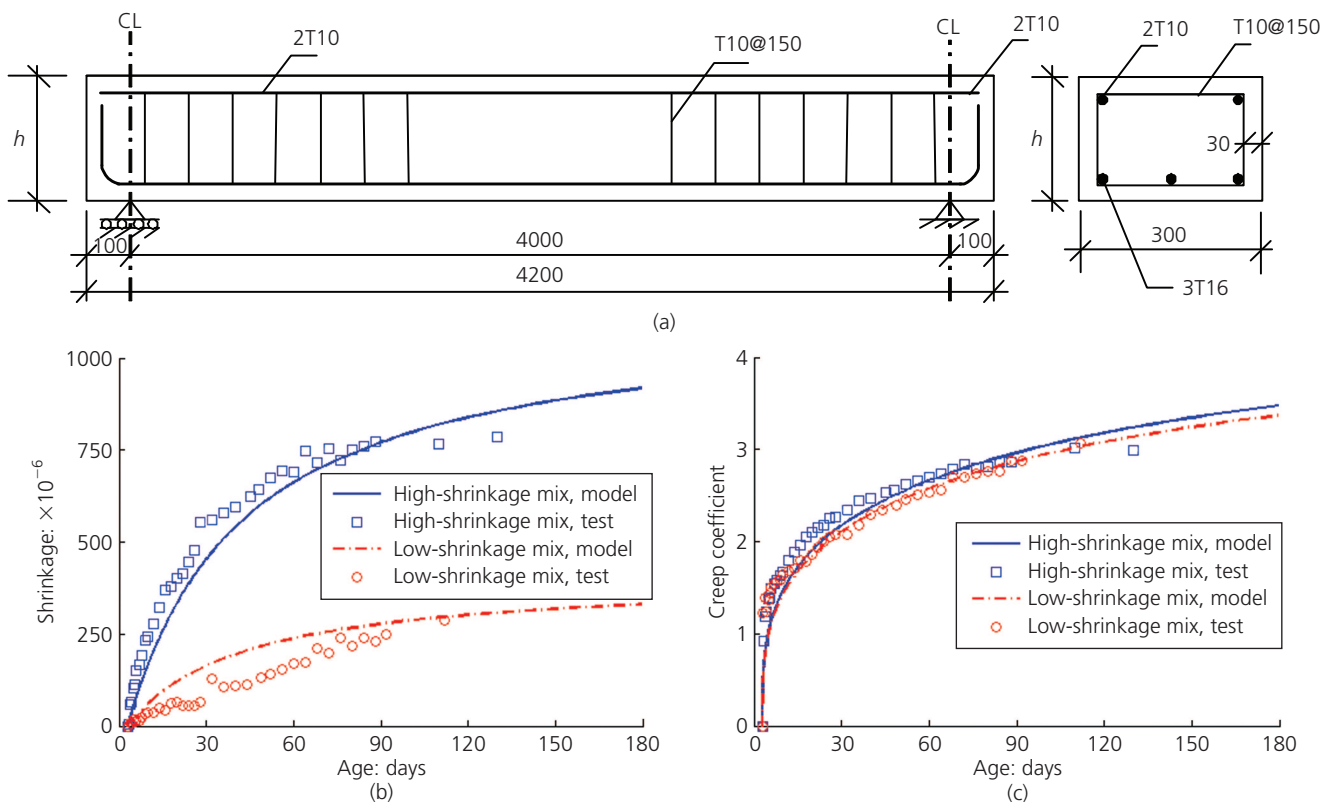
(a) Details of reinforcement of concrete beams (dimensions in mm). (b) Shrinkage plotted against time. (c) Creep coefficient plotted against time
